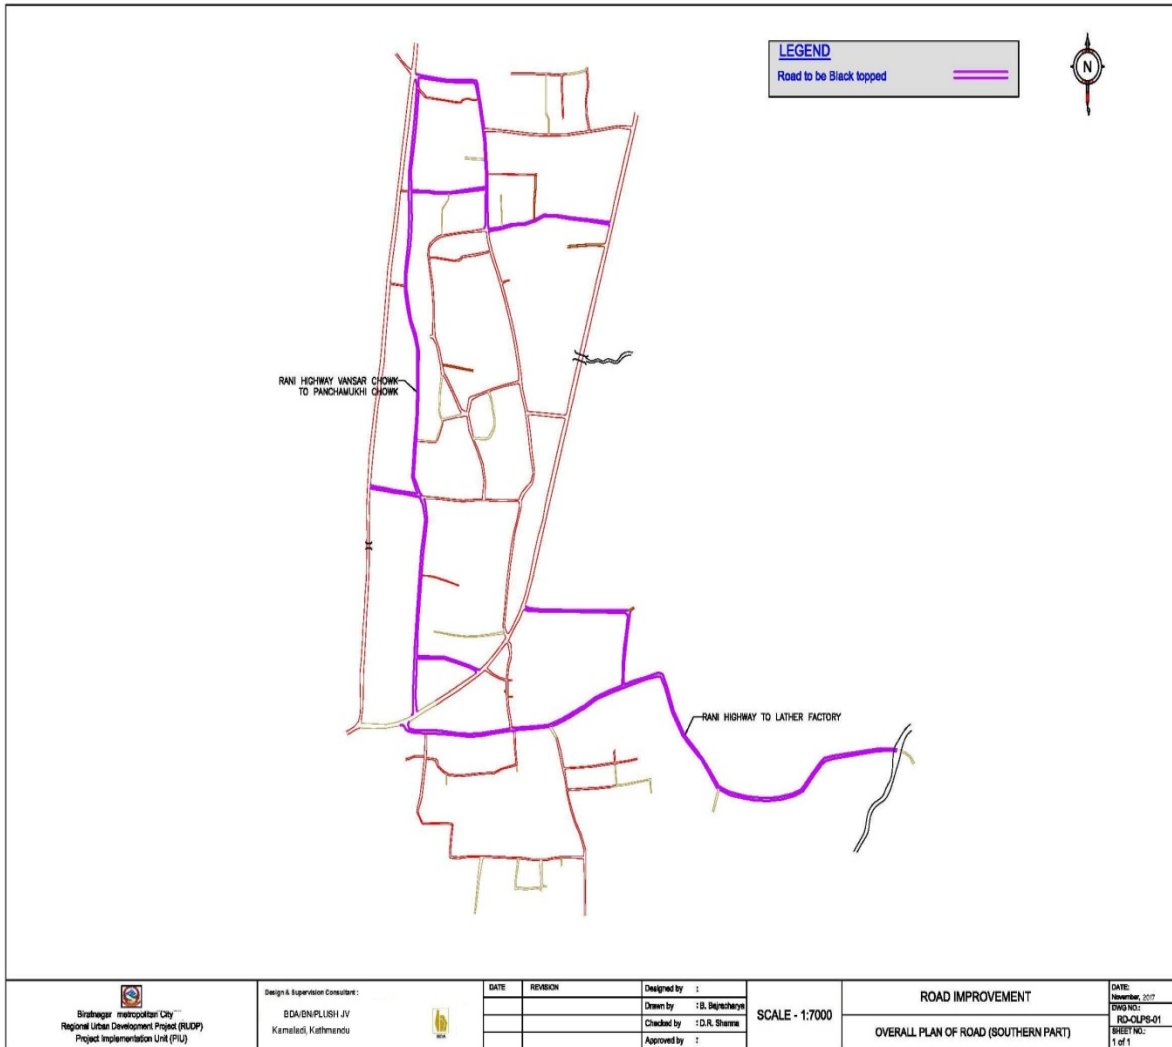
Overall Layout Plan of Road Improvement Networks (Southern part/rani area)
